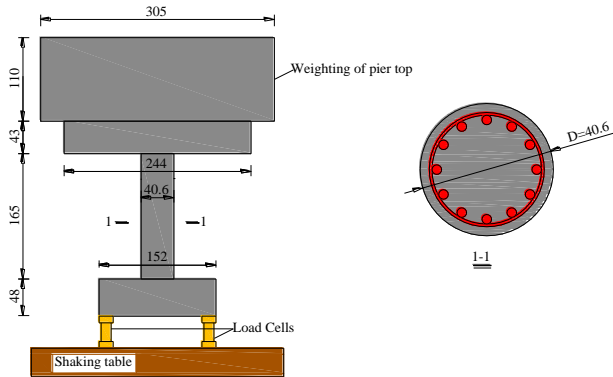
Geometry of the reinforced concrete single column pier (unit: cm)
